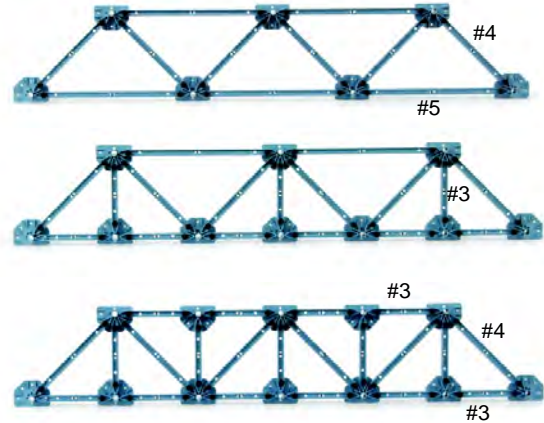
(Top) Warren Bridge. (Middle) Warren with deck verticals. (Bottom) Warren with verticals.
